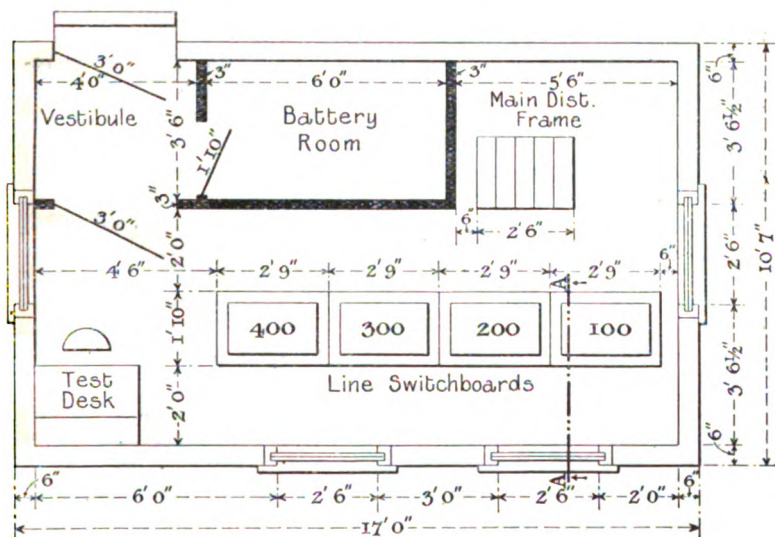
Floor Plan of Building to House District Station of 400 Lines.
